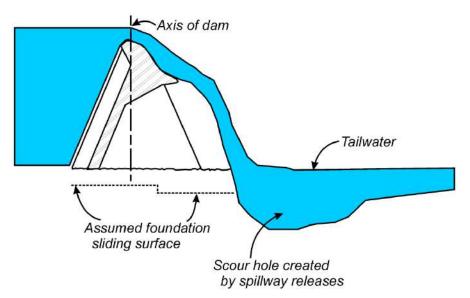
Scour downstream from concrete dam showing potential for daylighting of foundation discontinuities (Reclamation).
